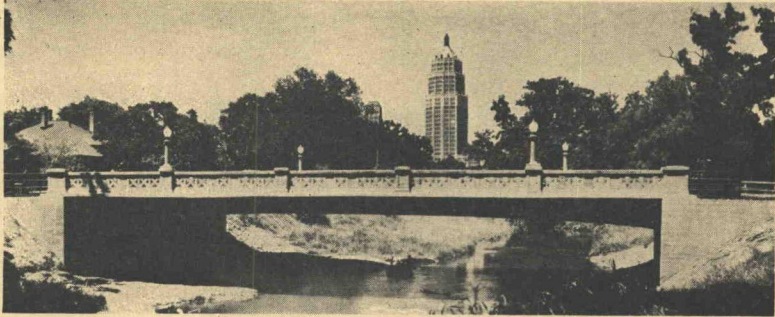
Rigid Frame Bridge at San Antonio, Texas
